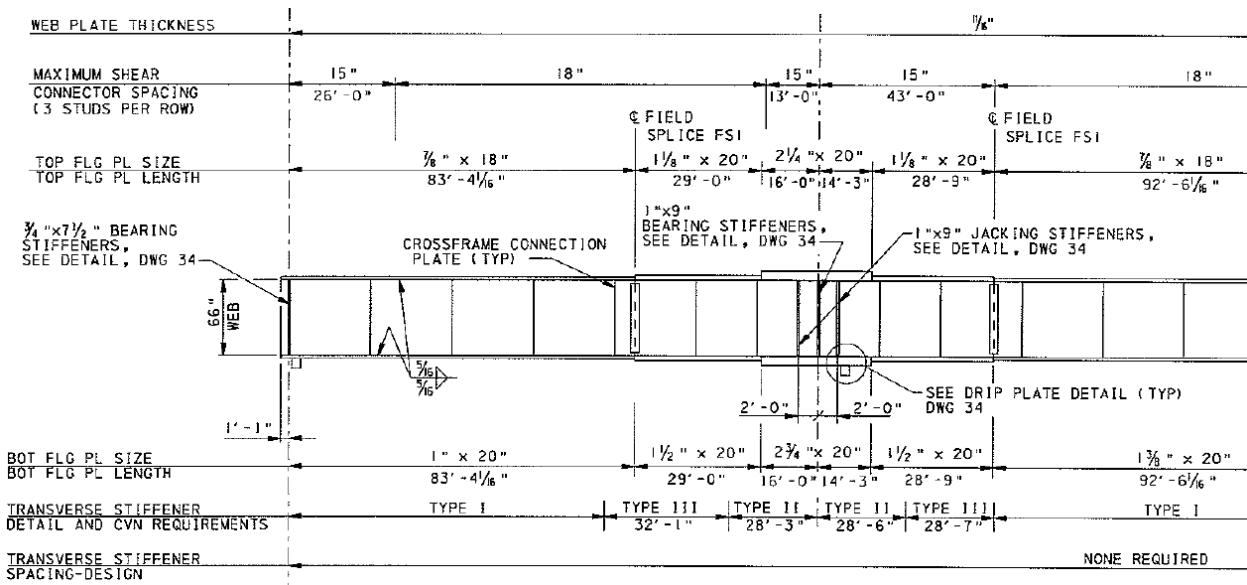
Ramp 119 S-N Girder 1 Elevation
